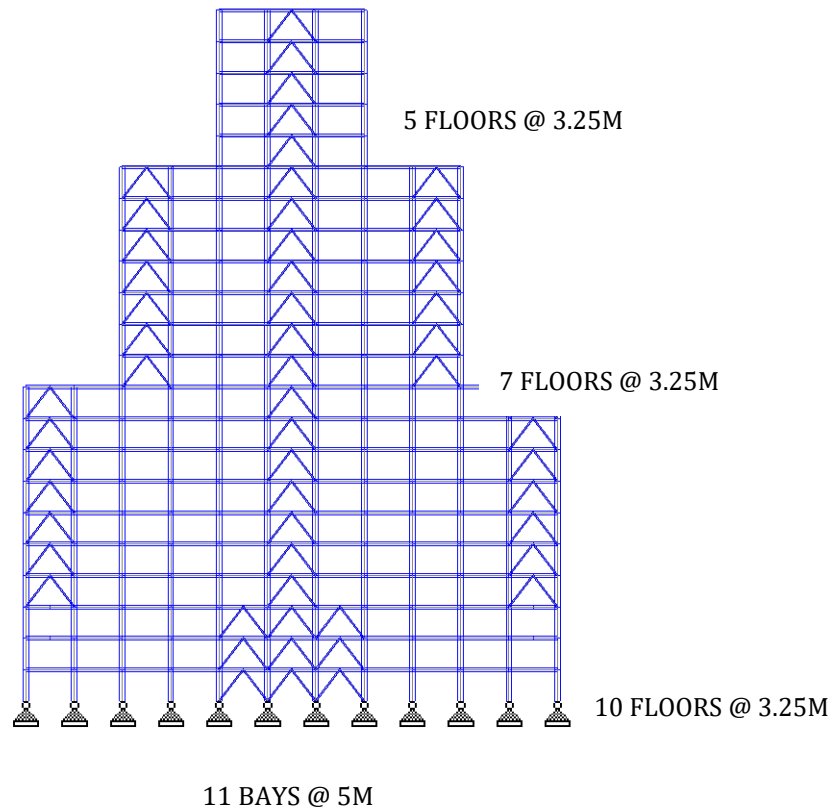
G+21 storey Building Elevation with Stepped Architecture
